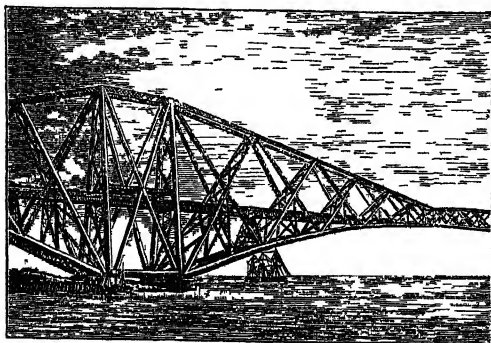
One of the Cantilevers of the Forth Bridge.
